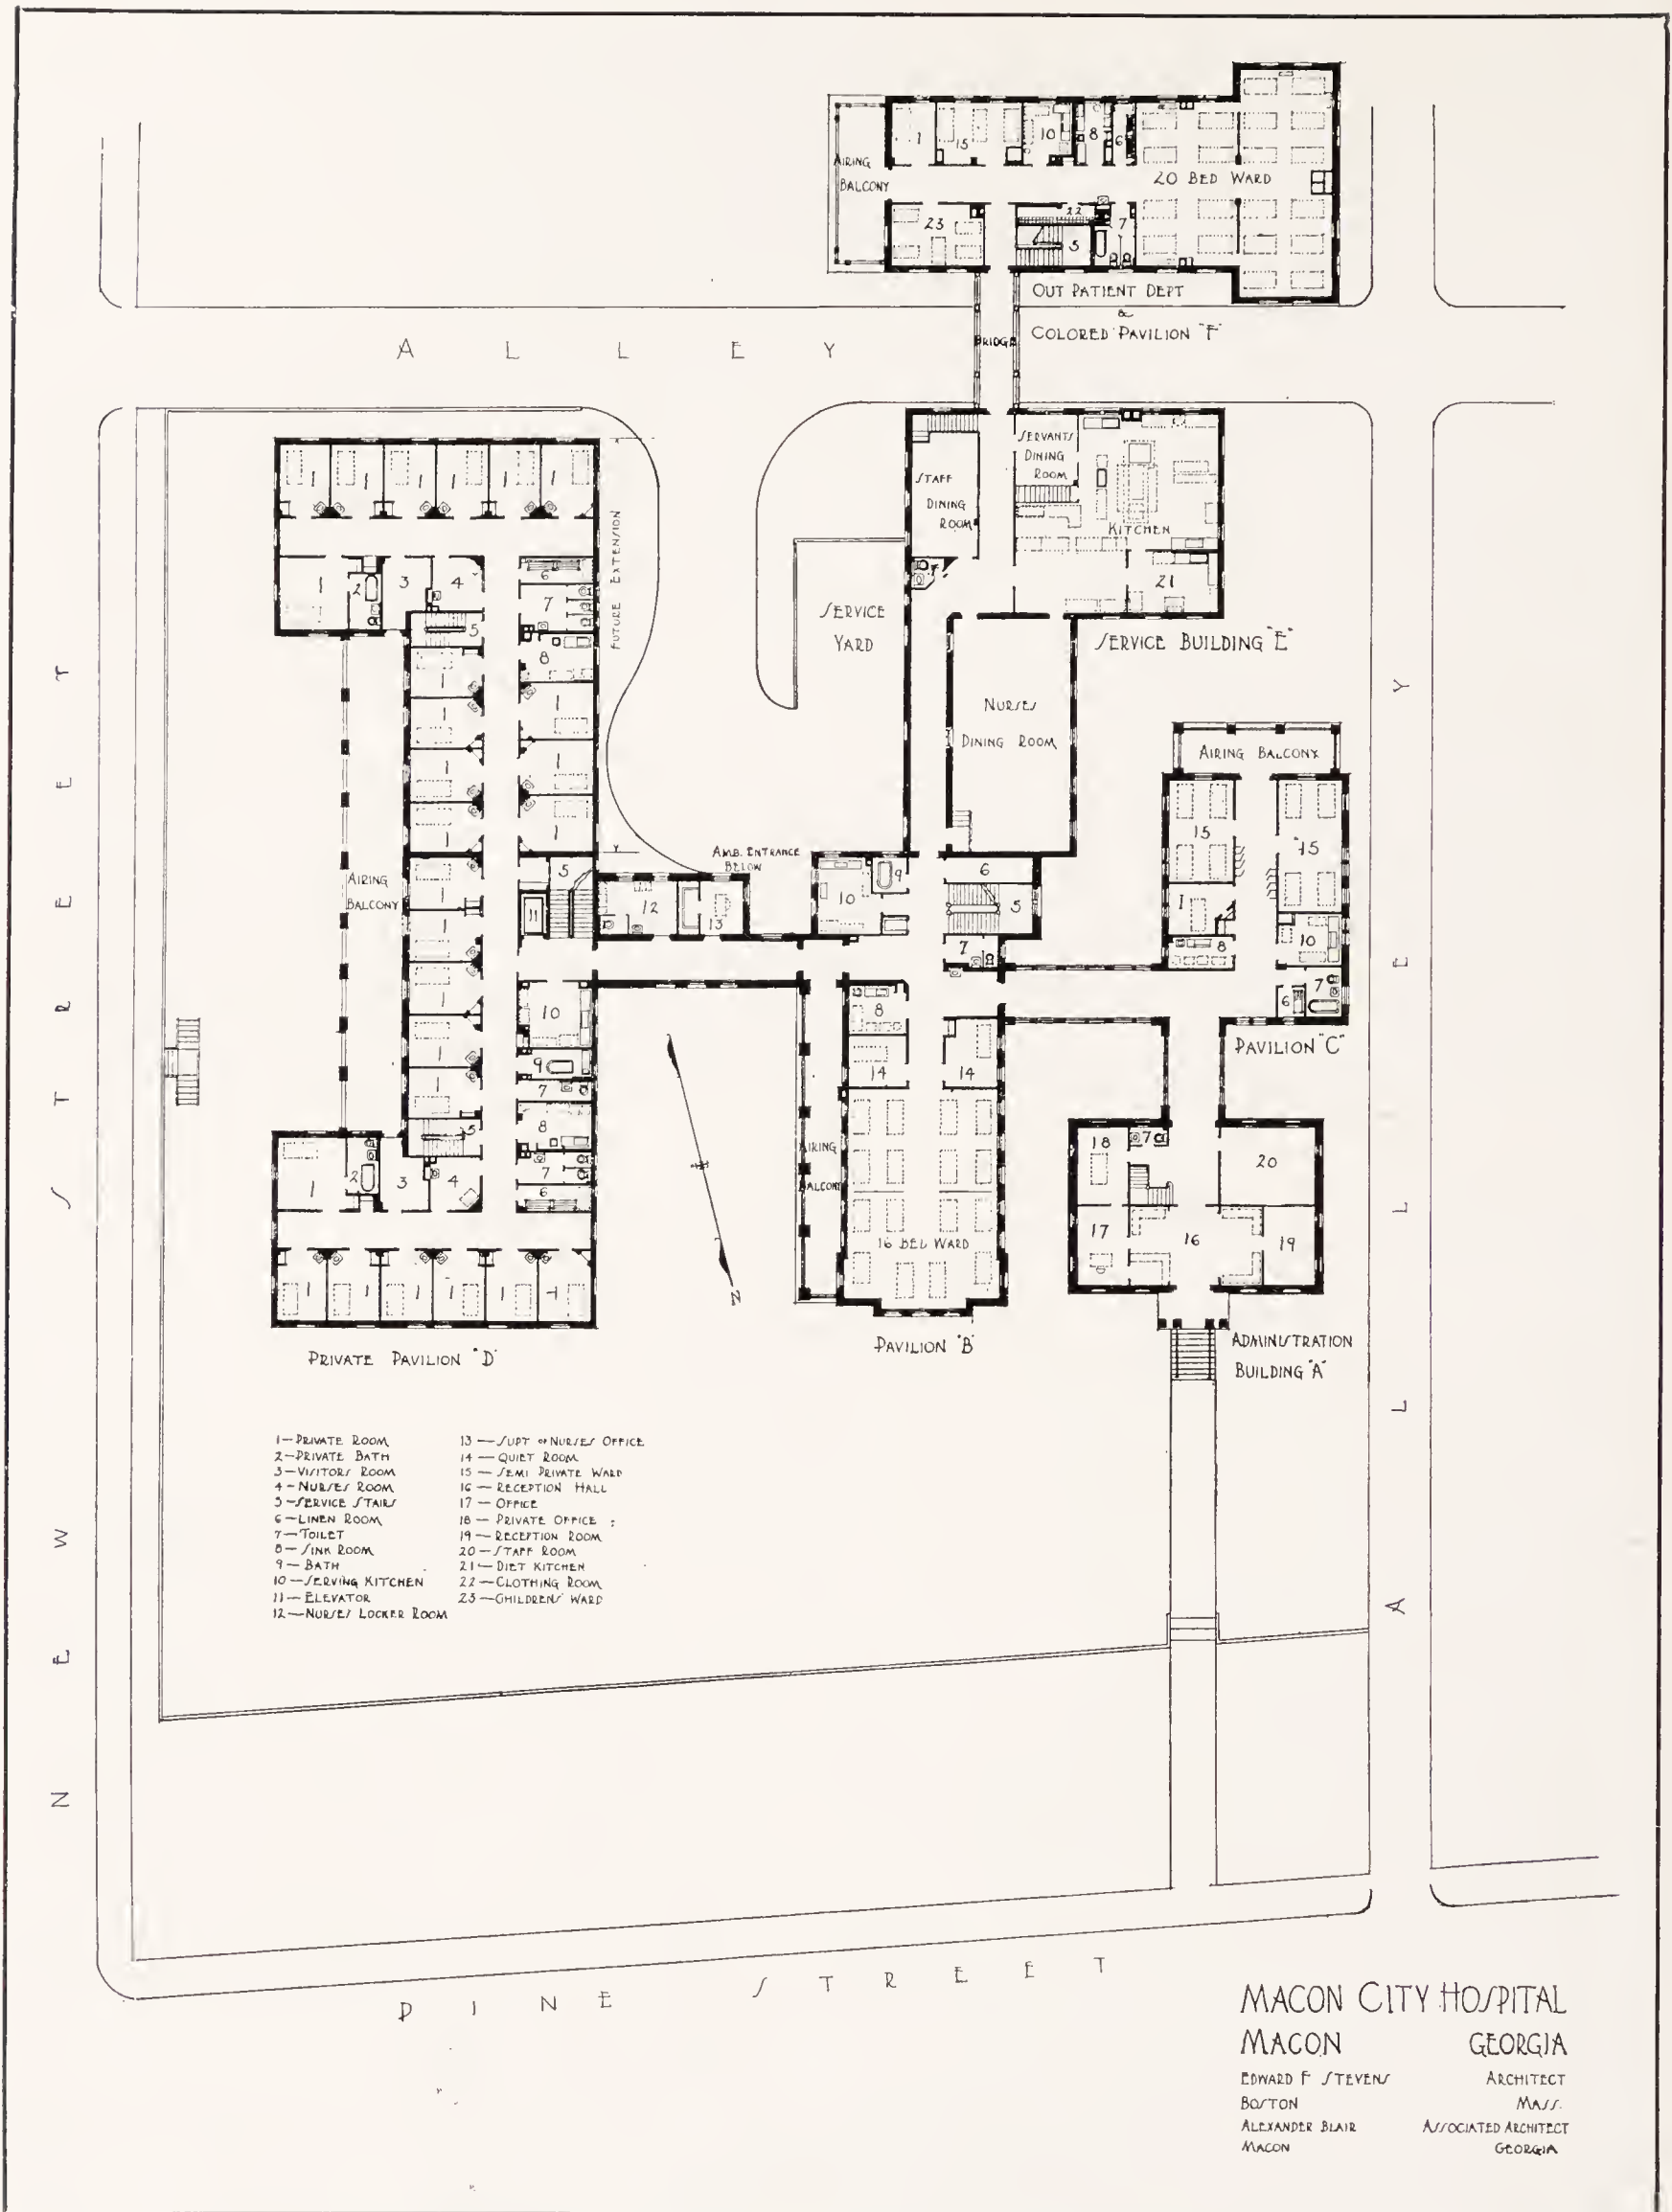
FIRST FLOOR PLANS, MACON CITY HOSPITAL, MACON, GA.
